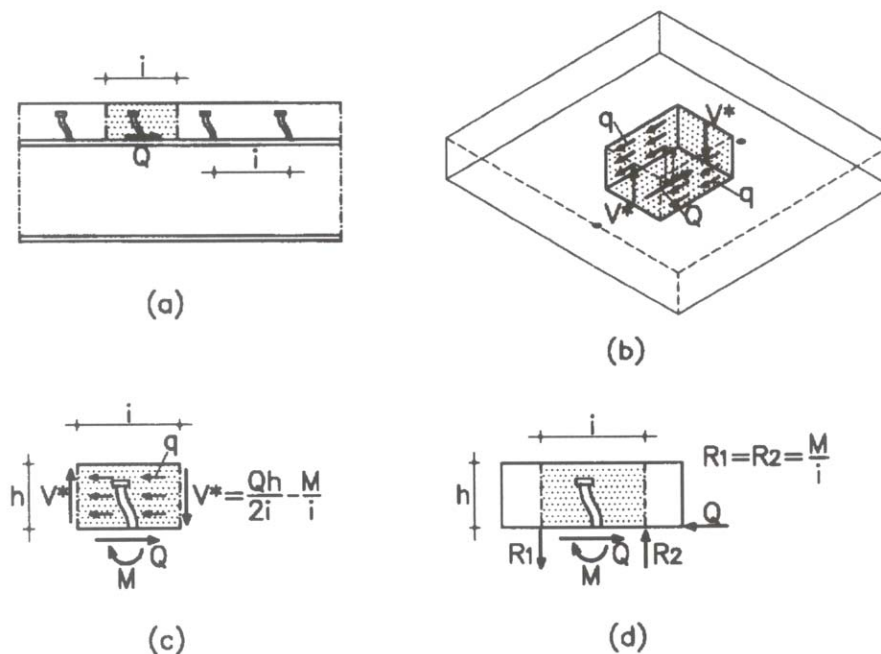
Applied forces and reactions associated with direct-shear test setup: (a) element in the beam; (b) concrete element in three-dimensional view; (c) forces acting on the element; (d) forces acting on the specimen
